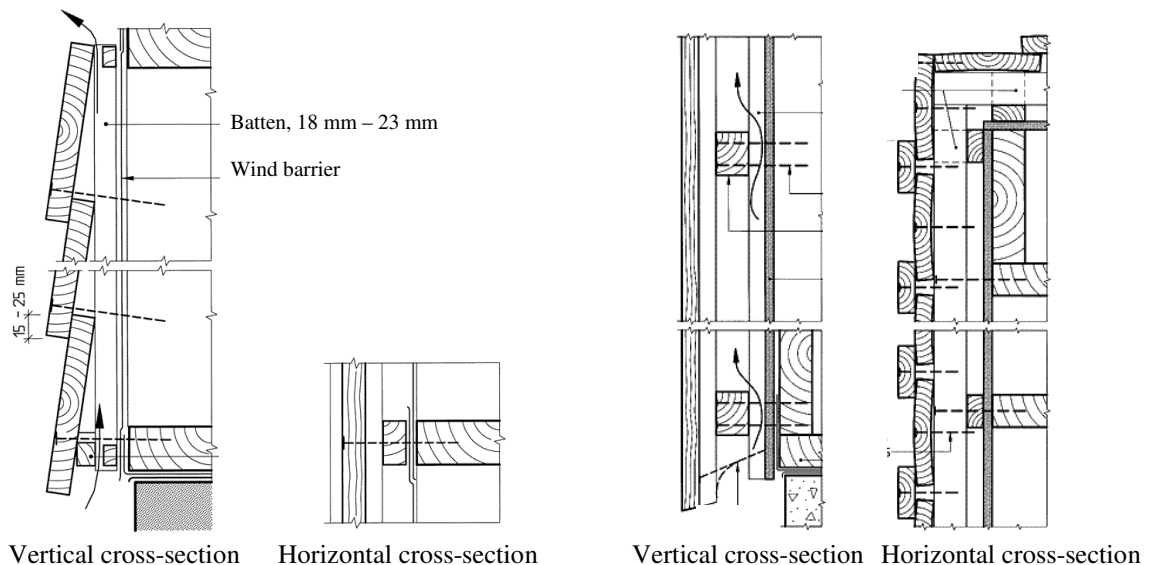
Example of ventilated claddings of horizontally (two left figures) and vertically mounted wooden panel, from SINTEF Building Research Design Guides 542.101 and 542.102.
